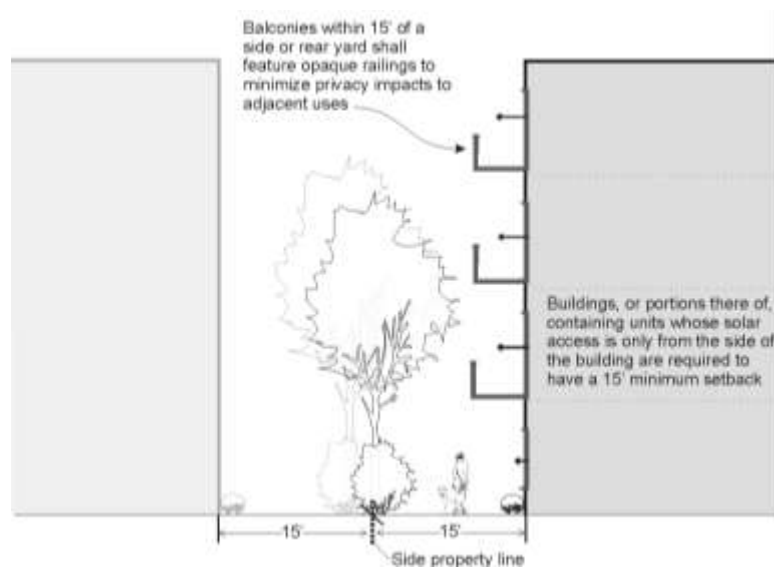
Solar access and privacy standards for multifamily residential buildings along side/rear yards.
